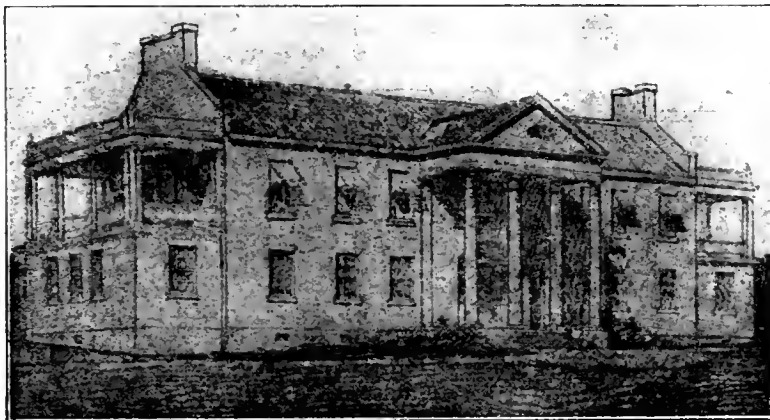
Front view of building (from architect's drawing): Exterior walls are of red brick with roof of red tile; exterior woodwork is painted white; the colonial style is especially adapted to this building, because of its prominent site and spacious grounds.
